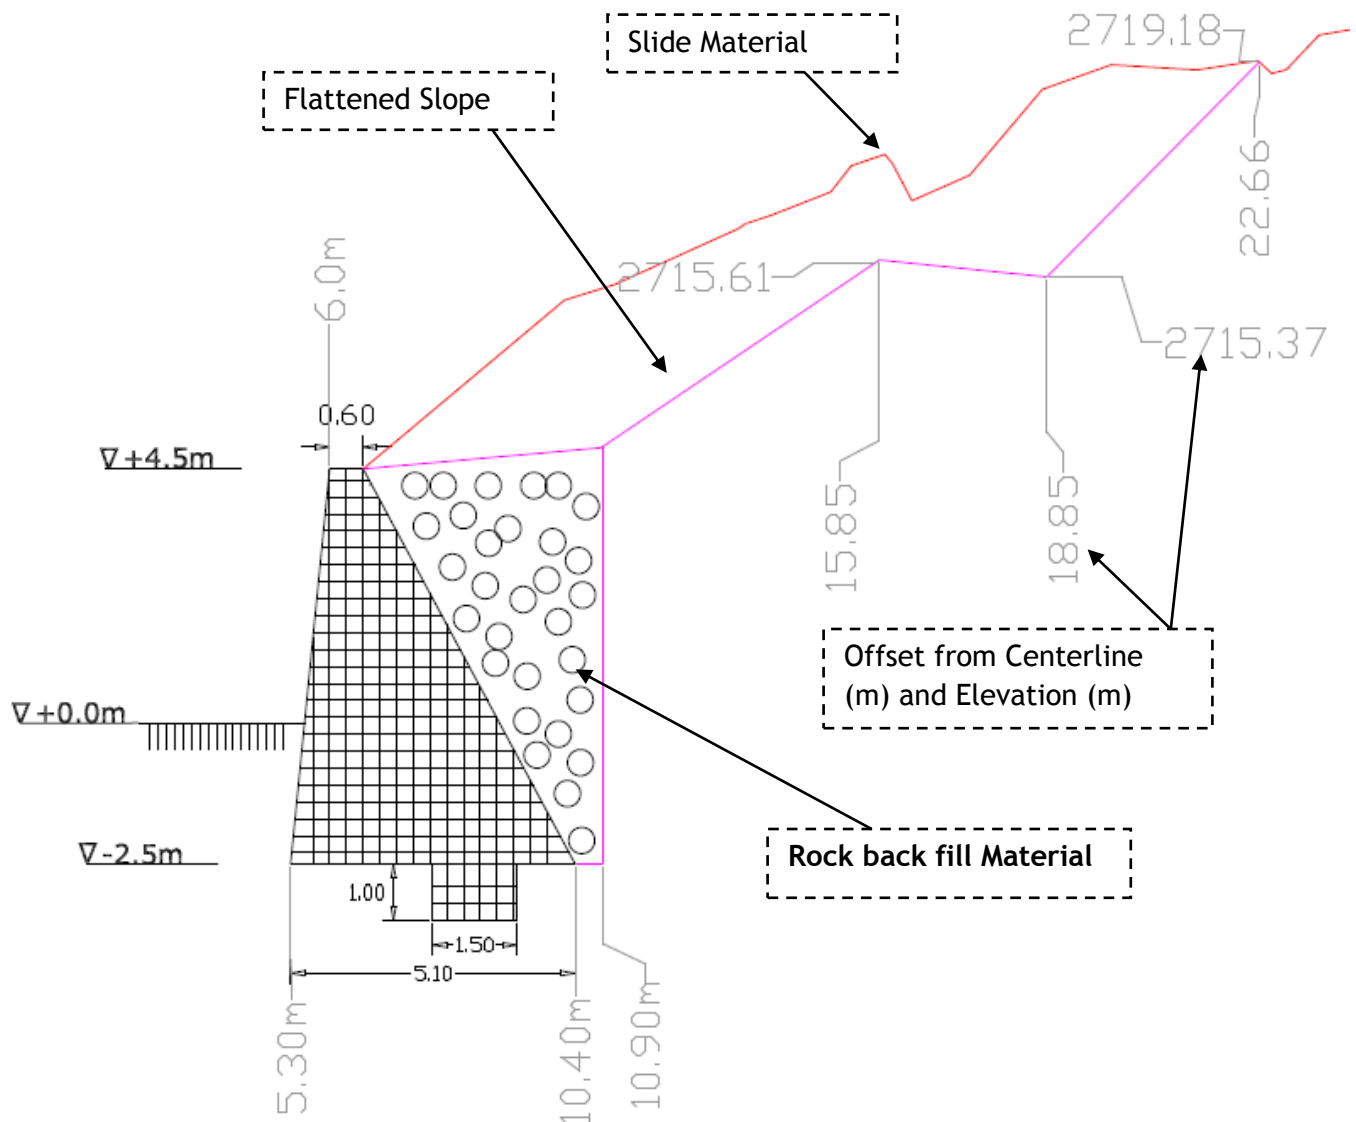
Typical Drawing of Masonry Retaining Wall with Shear Key at Sta.67+030RHS
